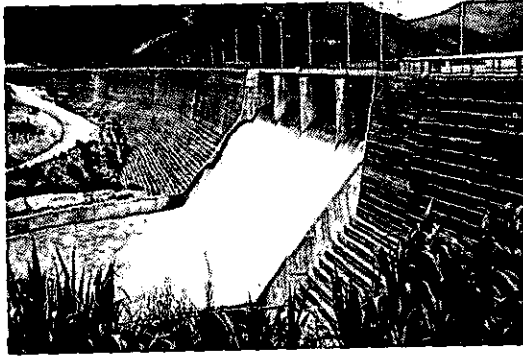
Concepcion dam, 8 years after installation of the exposed membrane system. Leaks from the liner amount to 0.01 l/s.
